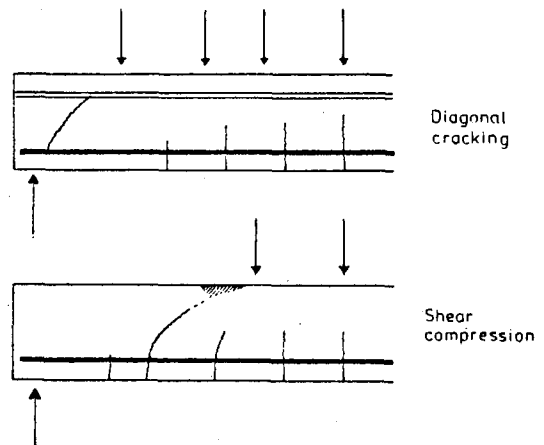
Possible shear fatigue failures in beams without shear reinforcement.
